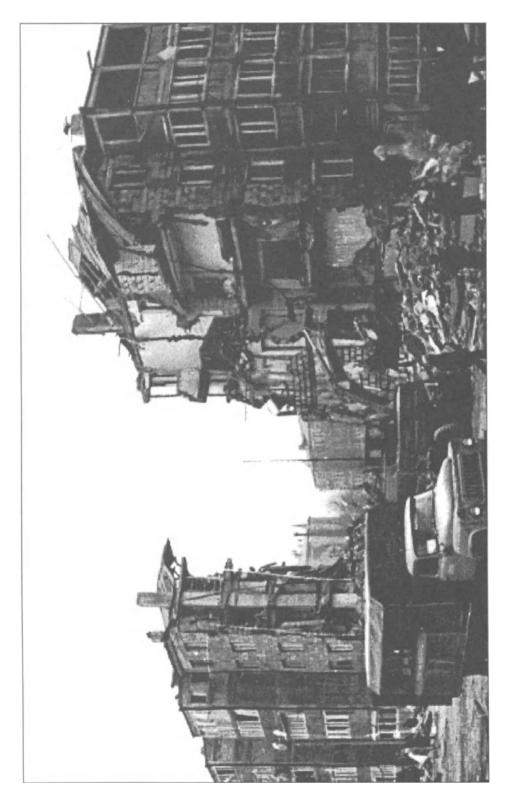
Damage to 5-story masonry buildings in Kirovokan.
